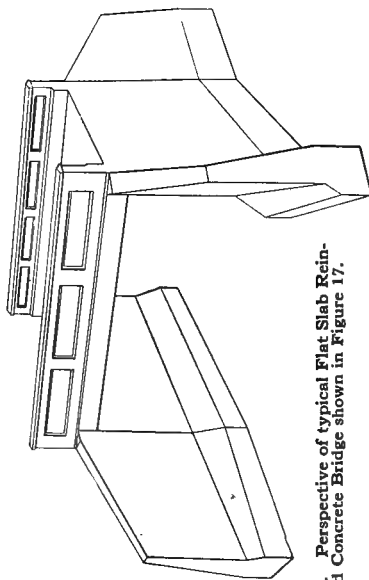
Perspective of typical Flat Slab Reinforced Concrete Bridge shown in Figure 17.
